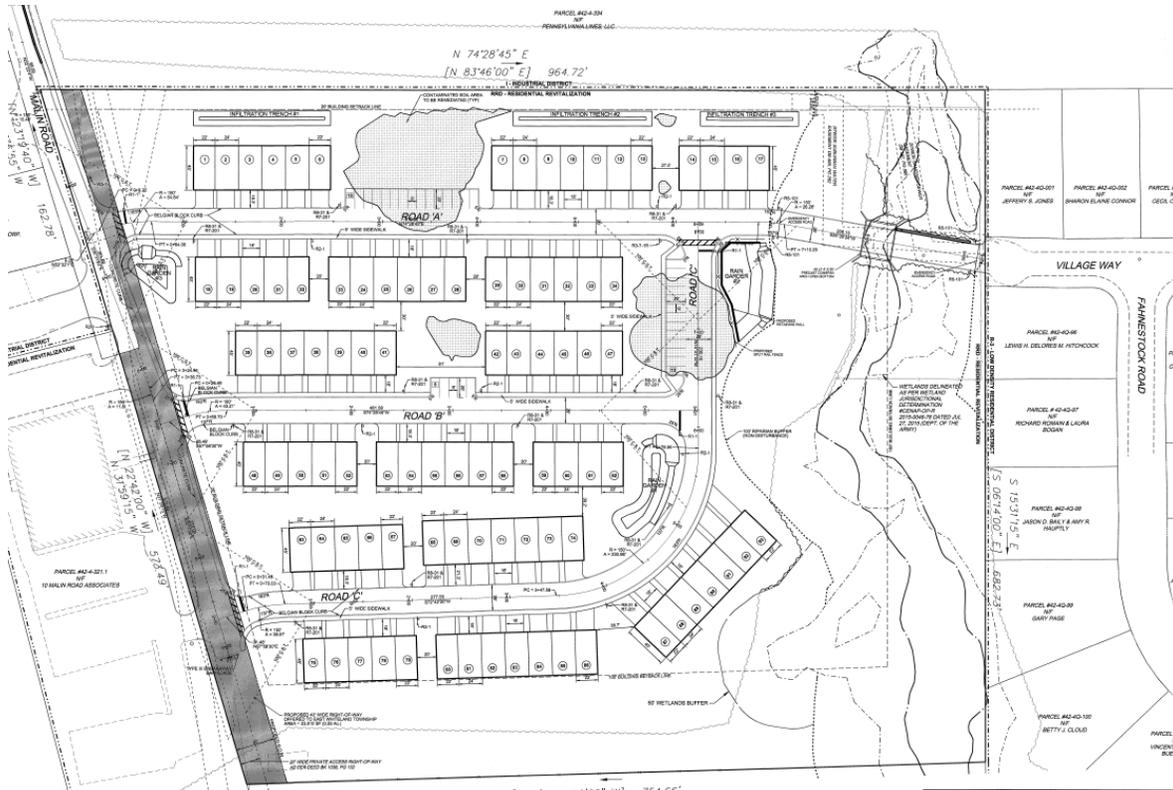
Revised Malin Road Development, including 93 townhomes. The grey areas in north, east and central portion of the site represent contaminated soil. Source: Sheet 4 of 24, Taylor Wiseman and Taylor (2018)
